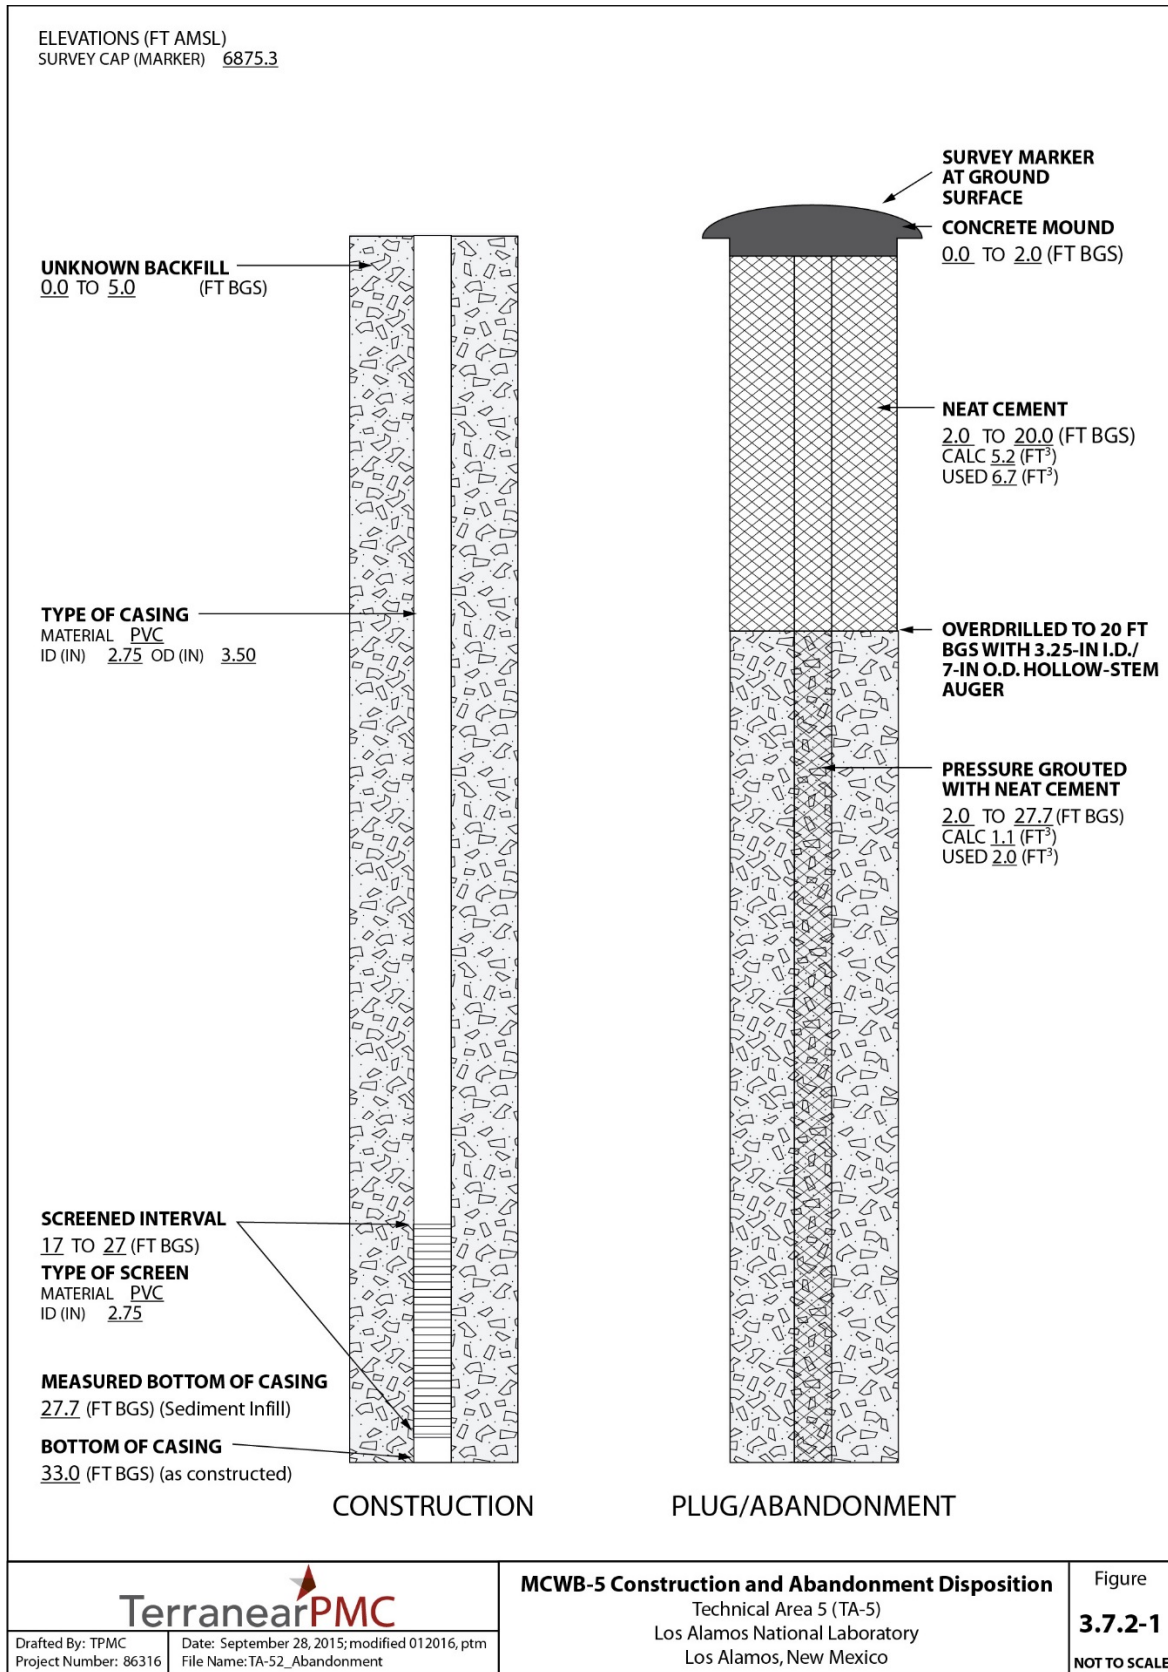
MCWB-5 well construction and abandonment disposition
